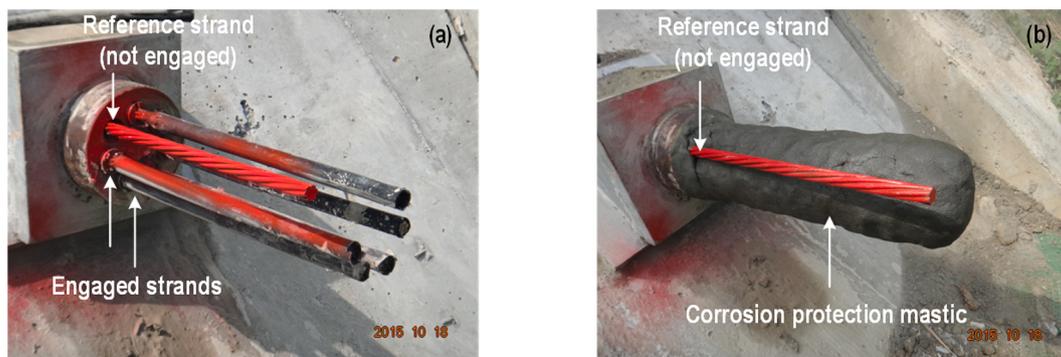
The photo of a sensing anchor during installed: (a) reference strand and engaged strands and (b) engaged strands and anchor head protected with mastic.
